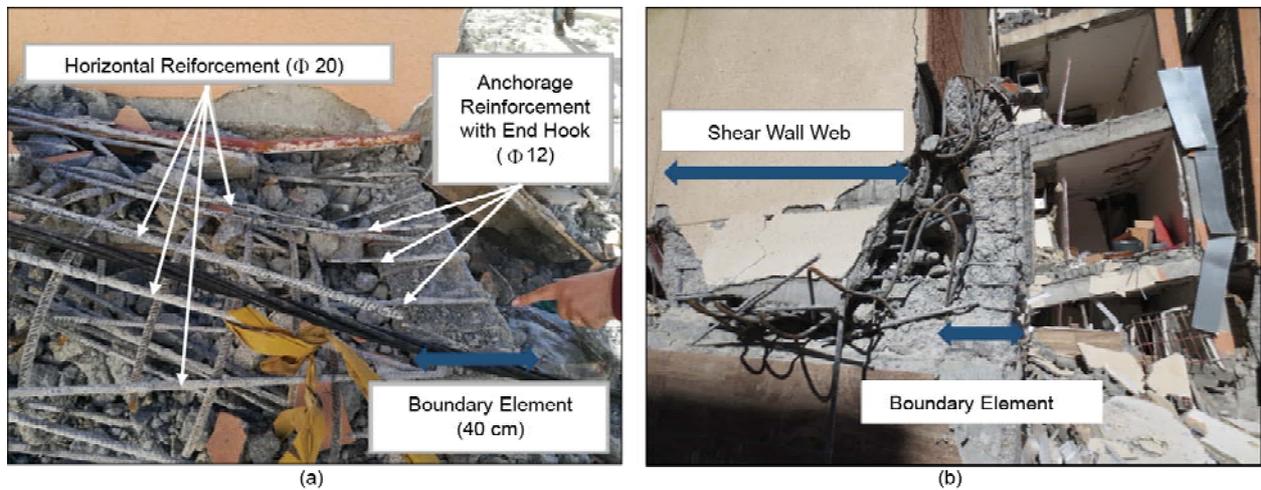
Detachment of boundray element and shear wall web due to the deficiencies in anchorage of horizontal reinforcements.
